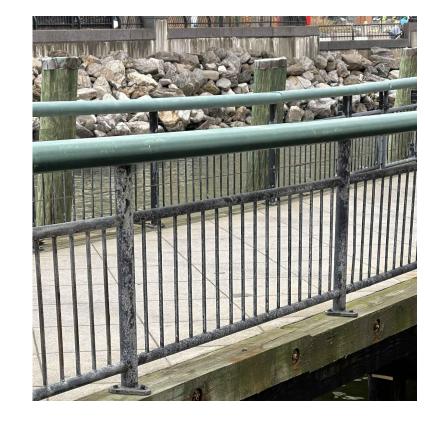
OPEN AREA #3 CORRODED HANDRAILS
